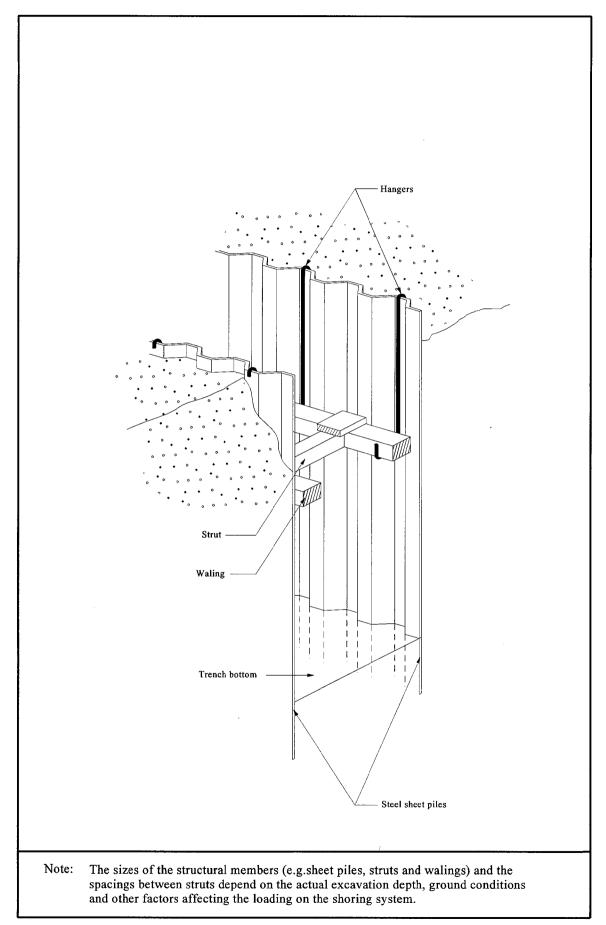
Typical arrangement of sheet pile shoring system with timber struts and walings
